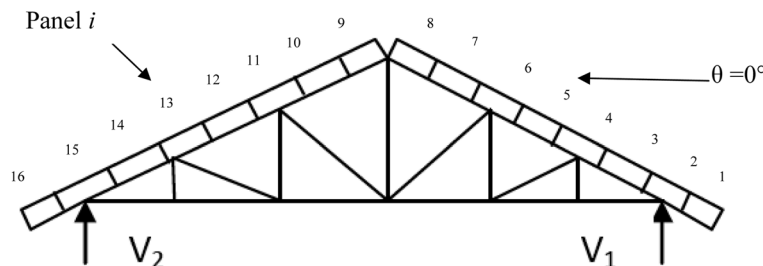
Schematic diagram of roof truss showing batten to truss connection panels and truss to wall reaction forces
